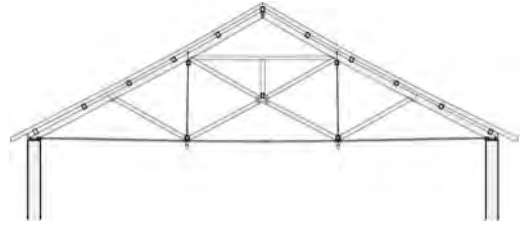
Principal Truss of the Riding hall in Thun, built 1866, span 20 m (K. Russnaik 2020).
